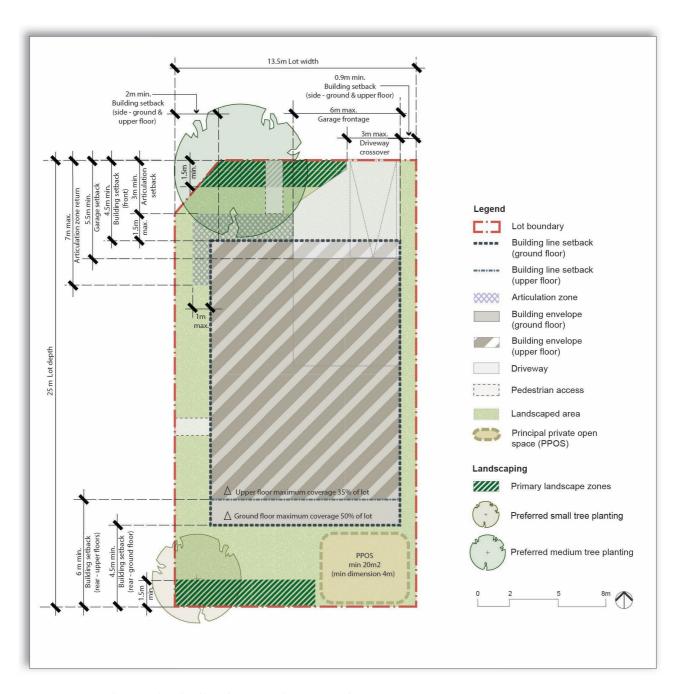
Typical corner lot dwelling layout on lots ≥12.5m but ≤15m
